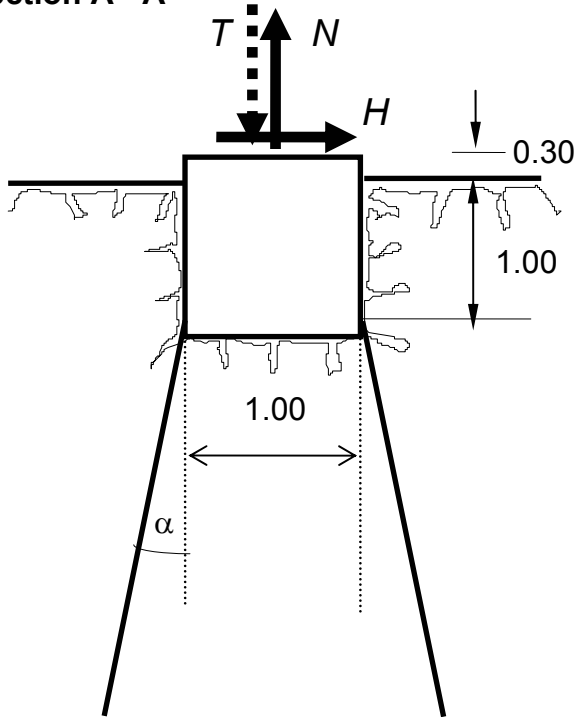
Micropile soil foundation, reinforced concrete frame head
